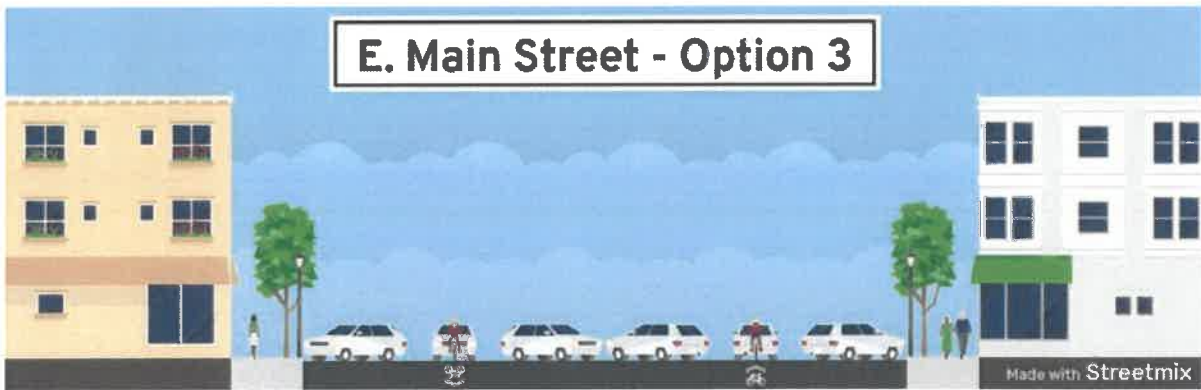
Downtown Streetscape Alternate Layout - Option 3
